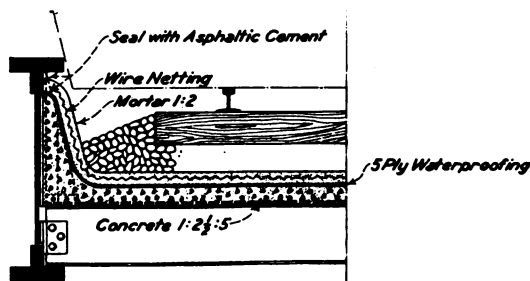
WATERPROOFING PLATE GIRDER BRIDGE WITH CONCRETE DECK AND PROTECTION COURSE.
